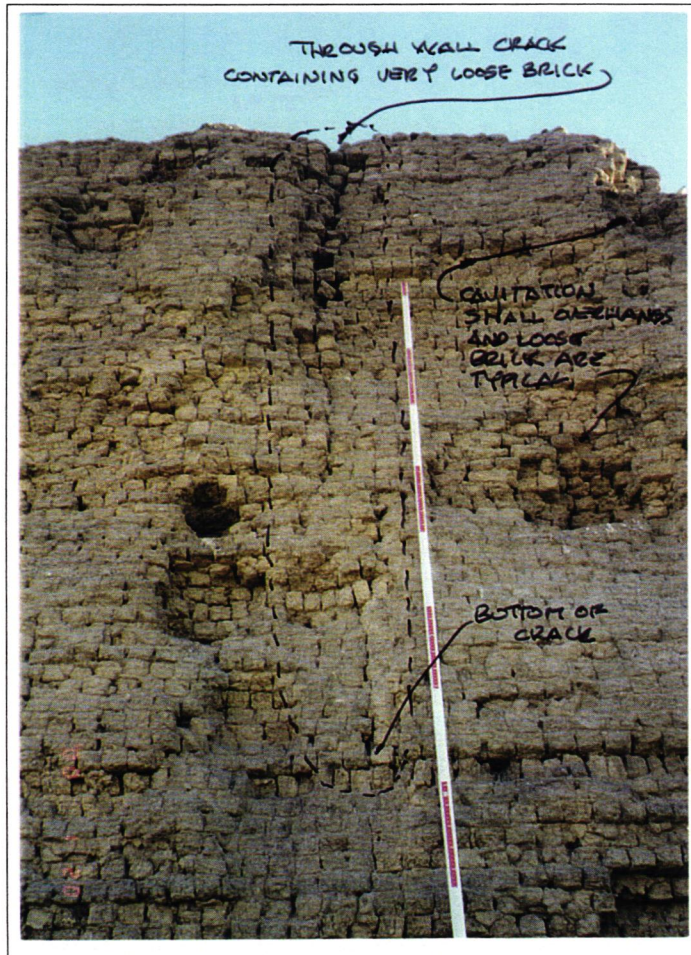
Interior Southwest Corner West Main Enclosure Wall
